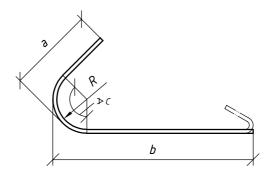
Bending dimensions — Shape code 99 (non-standard example)
